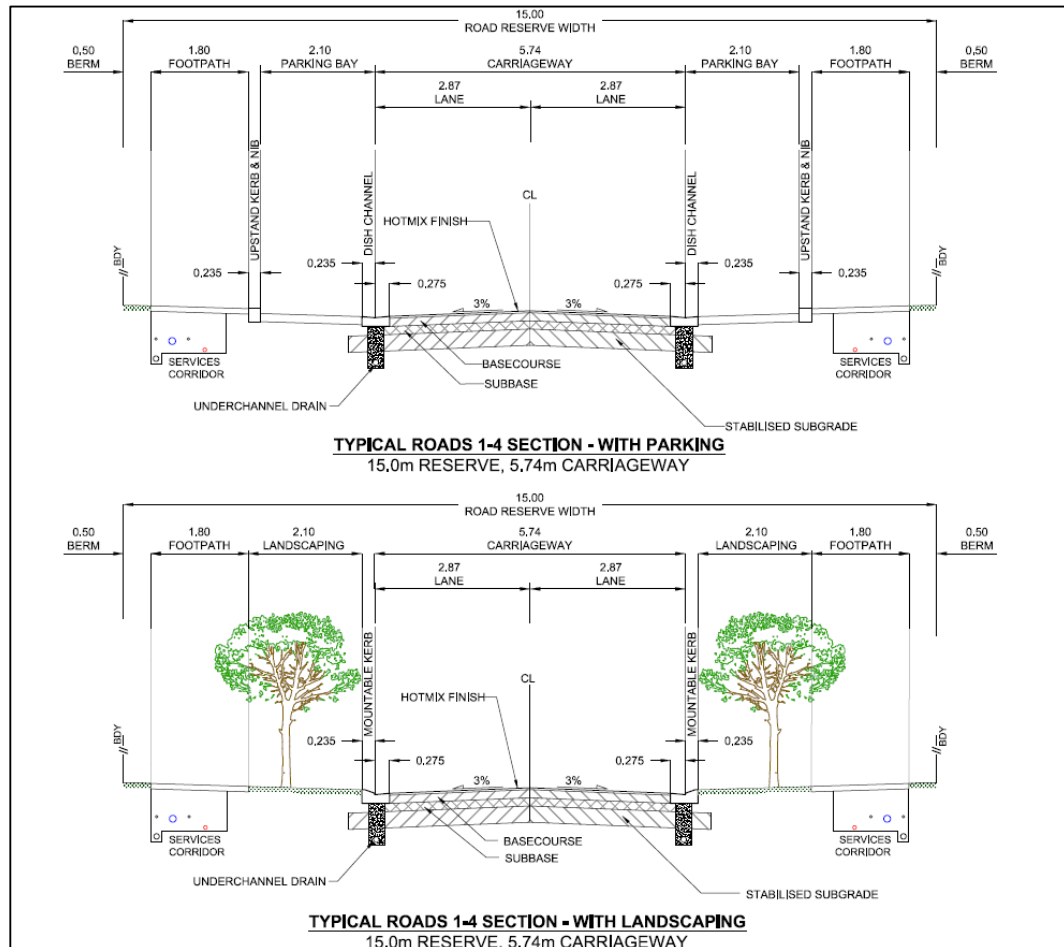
Proposed Road Cross Section – Road 1 to Road 4
